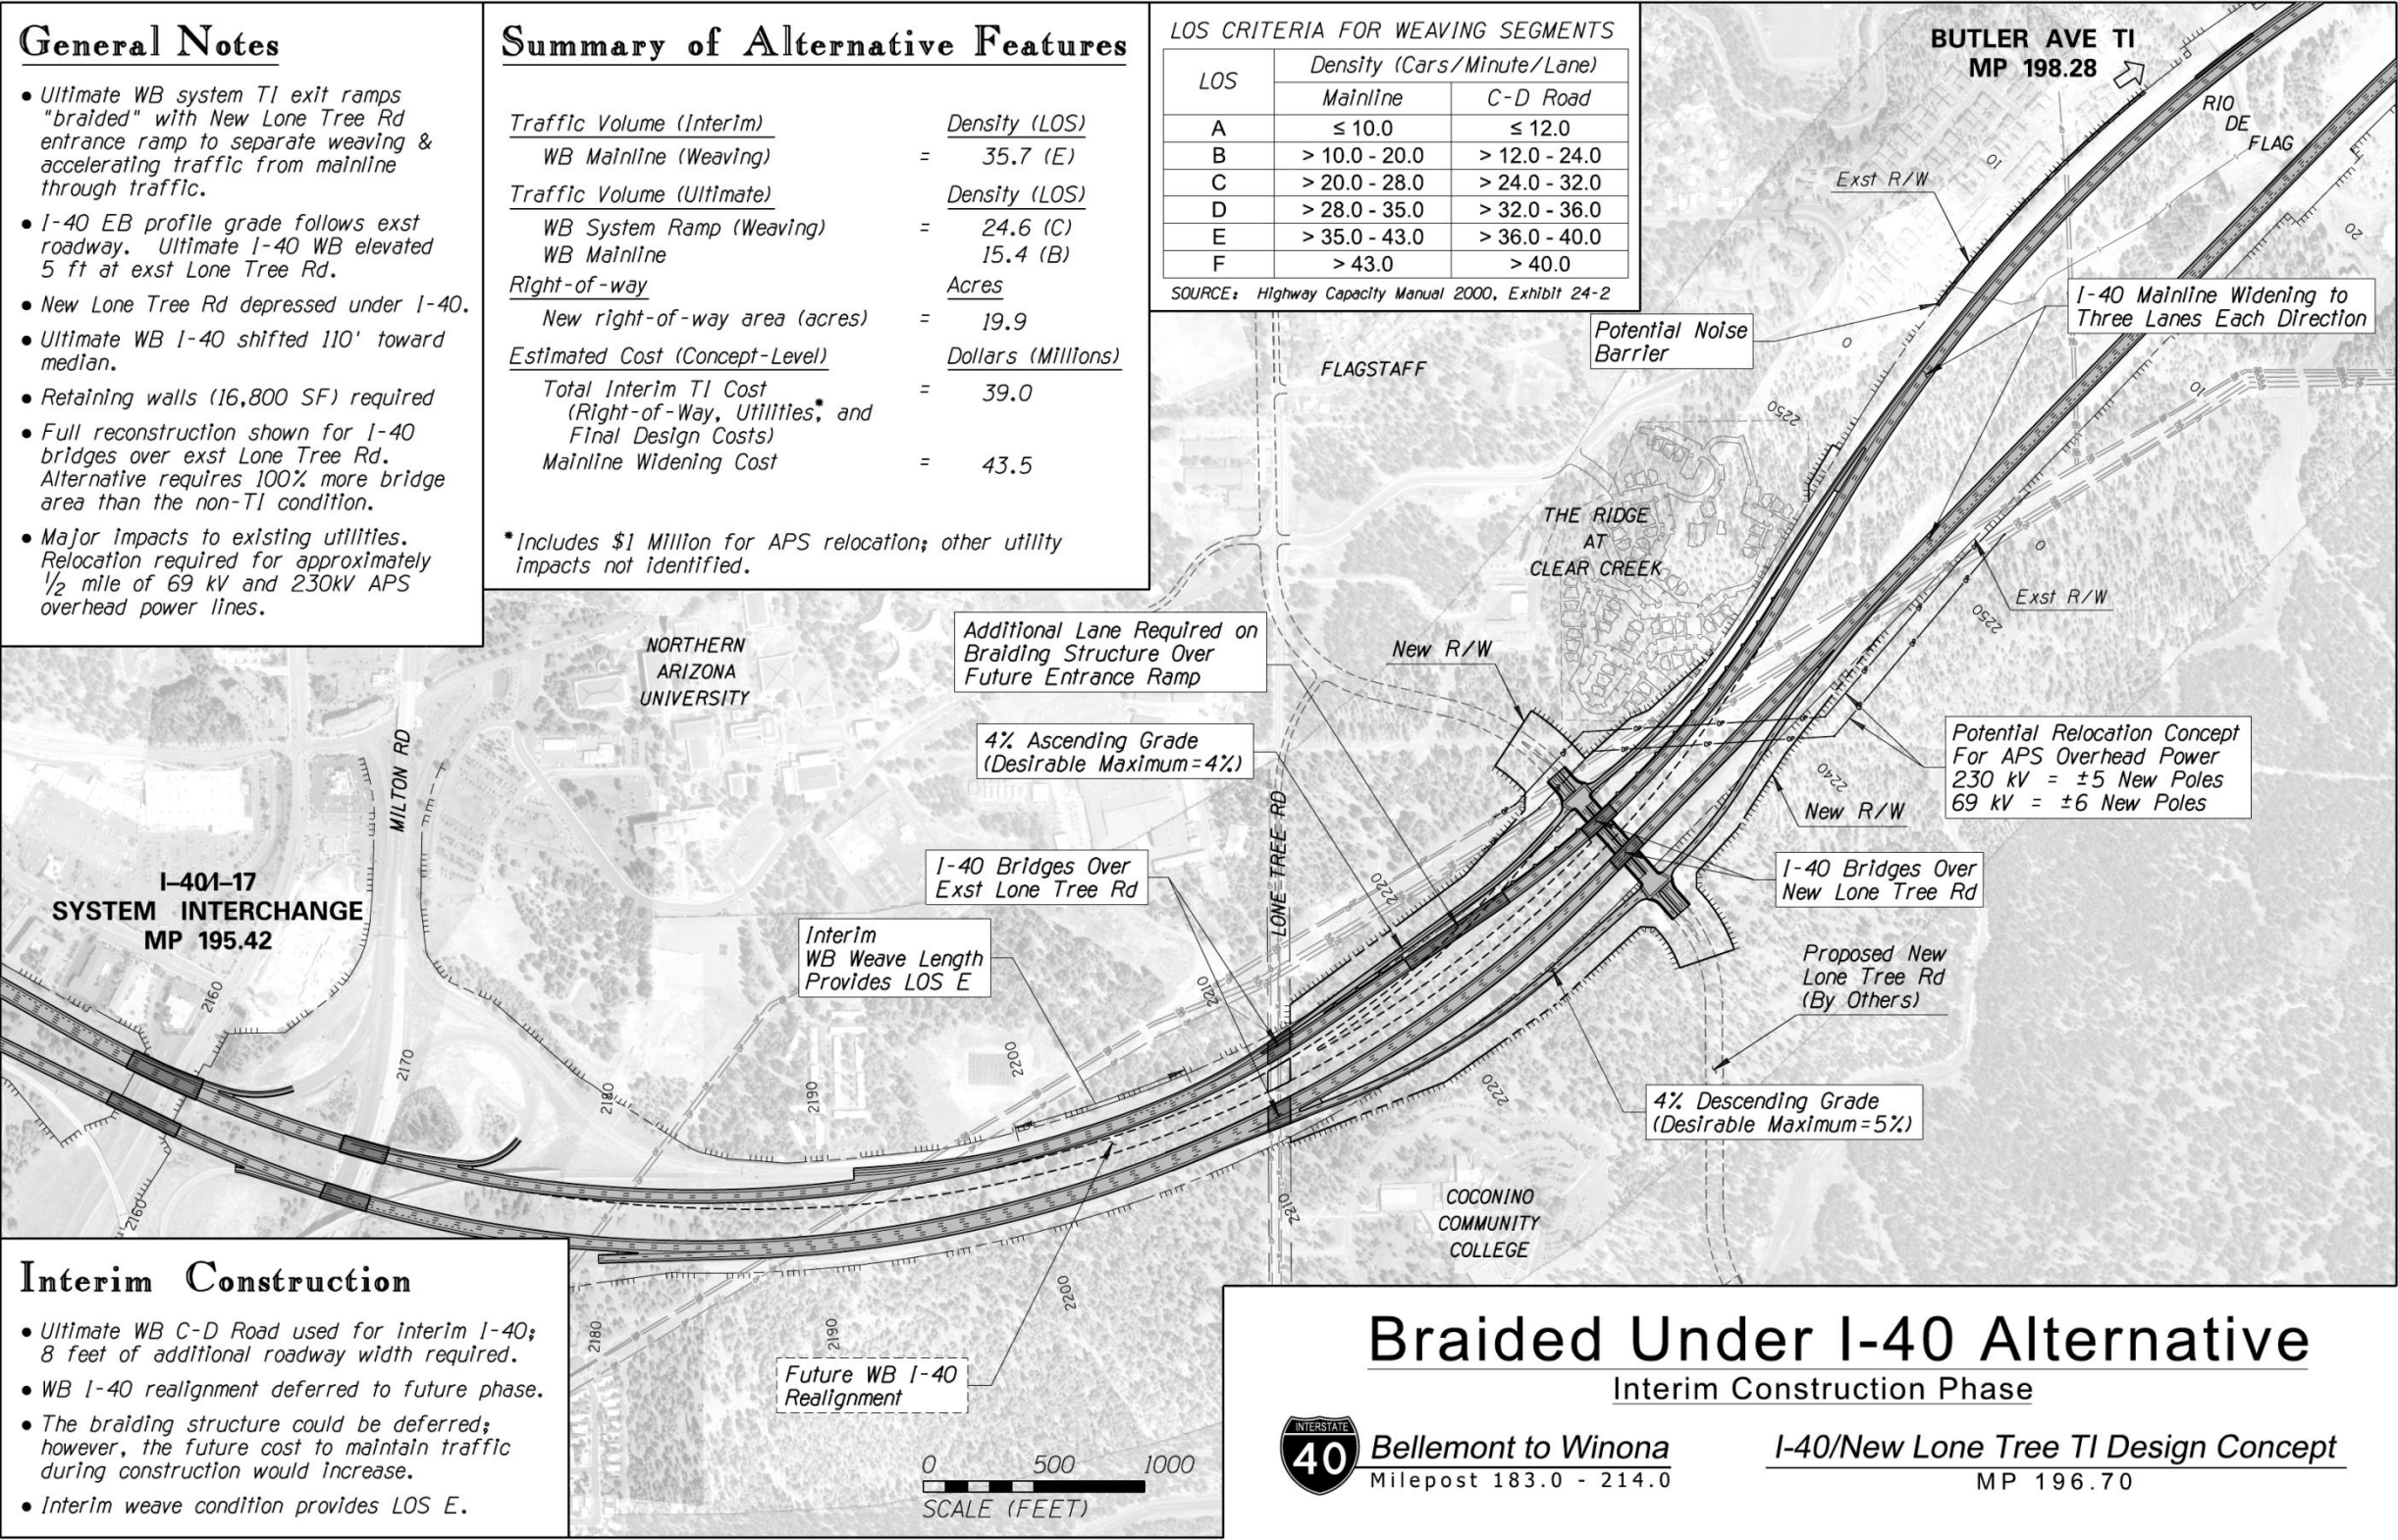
New Lone Tree TI Braided Under I-40 Alternative (Interim Construction Phase)
